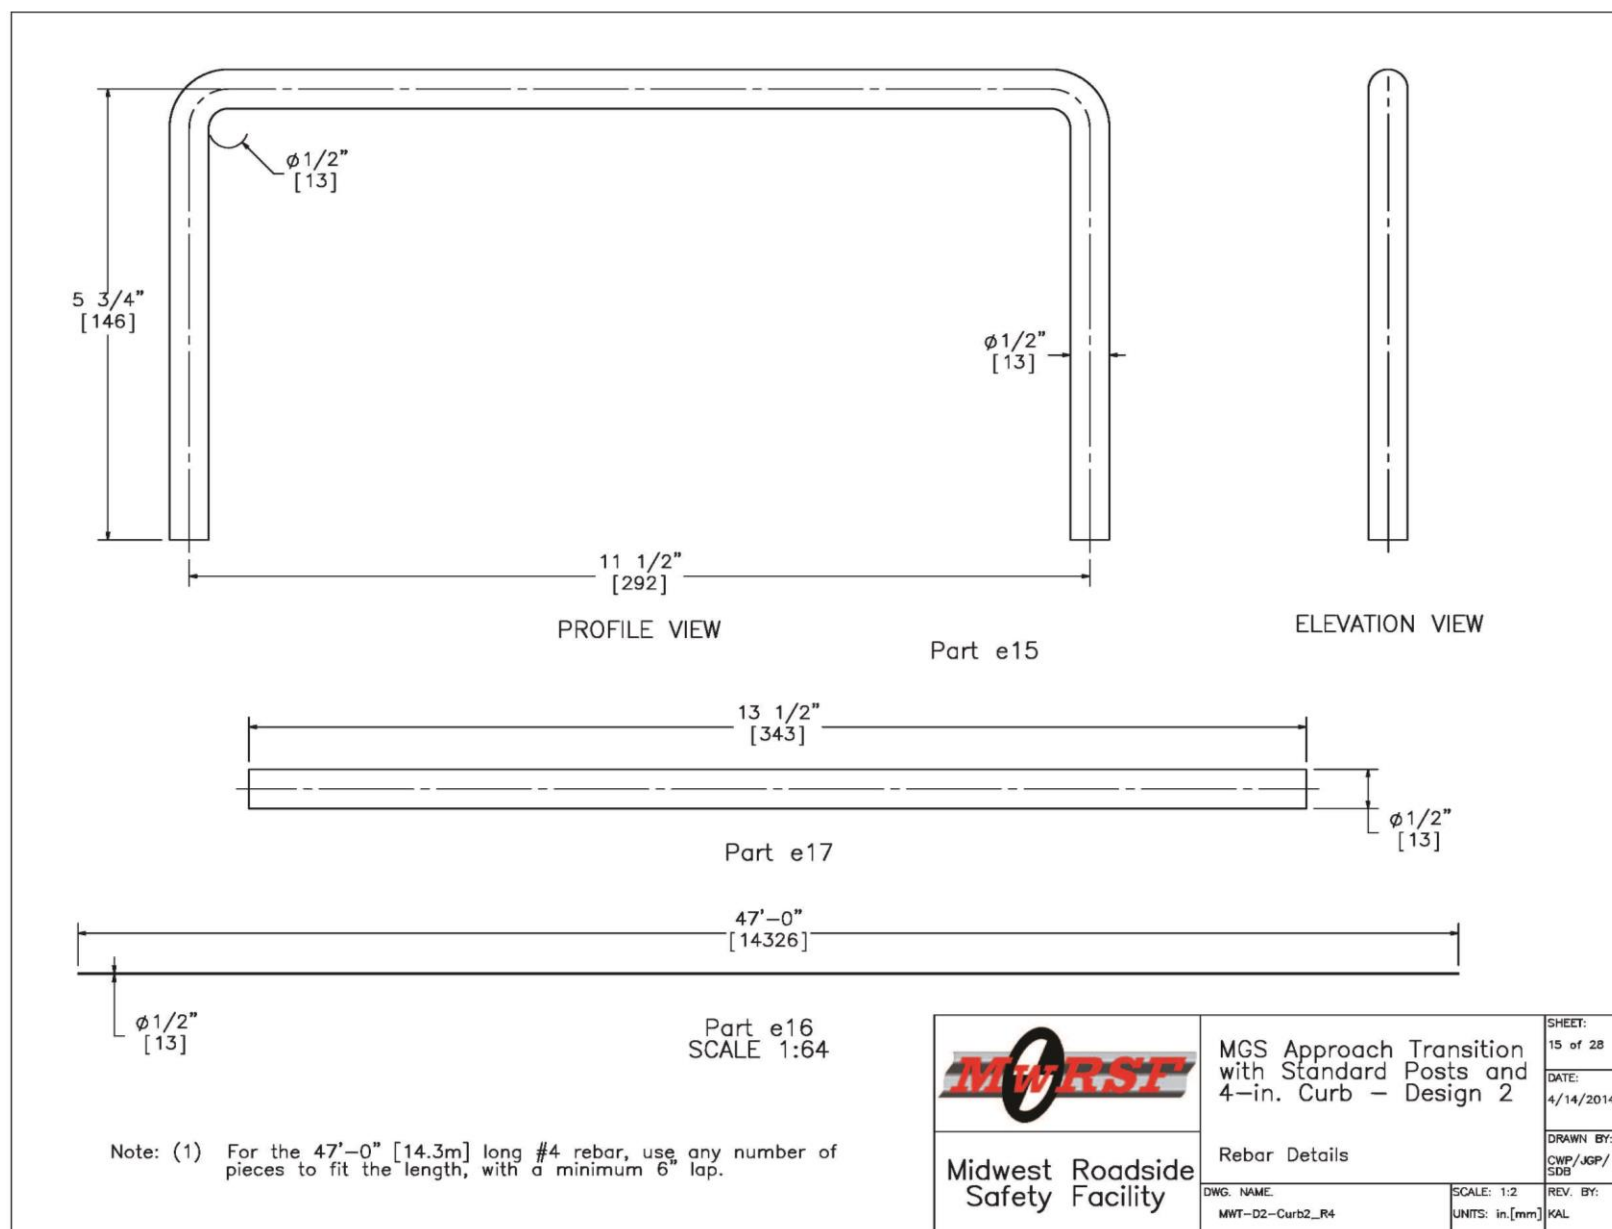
Rebar Details, Test Nos. MWTC-2 and MWTC-3
